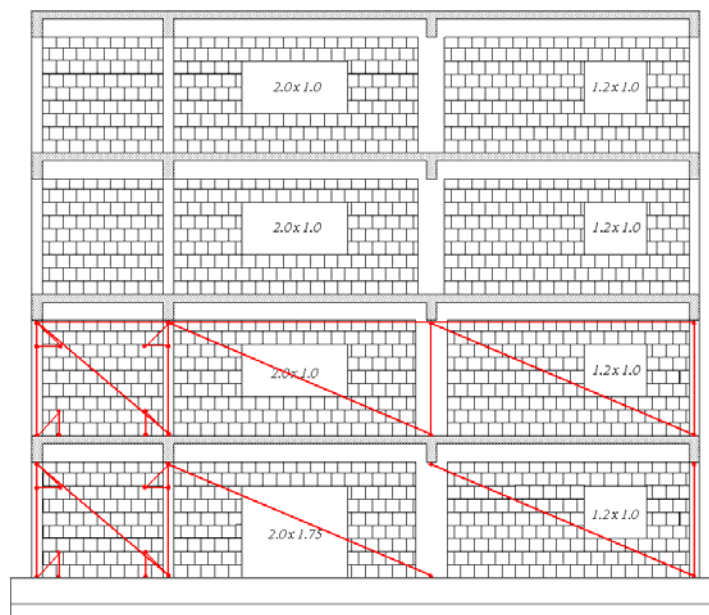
Infill masonry instrumentation (general layout): 1<sup>st</sup> and 2<sup>nd</sup> storeys
